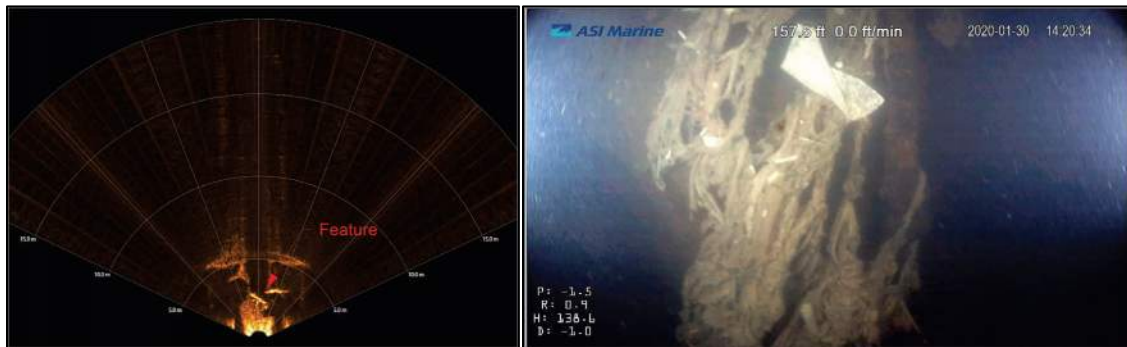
Sonar image of manhole chamber at 148 feet (left); Image of biofouling on ladder at 157 feet (right)
